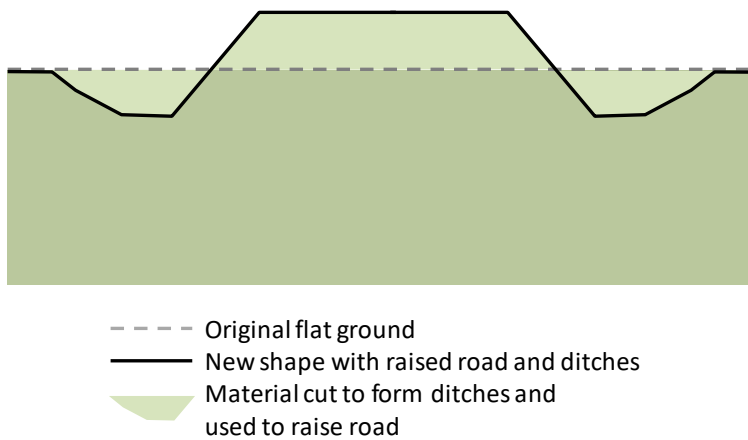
CROSS SECTION OF A TYPICAL RAISED ROAD WITH DITCHES CREATED ON BOTH SIDES FOR DRAINAGE.
